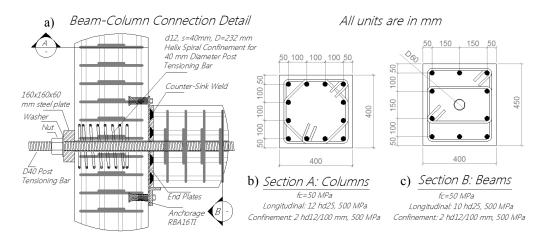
a) Beam-column connection detail, b) Column reinforcement detail, c) Beam reinforcement detail
